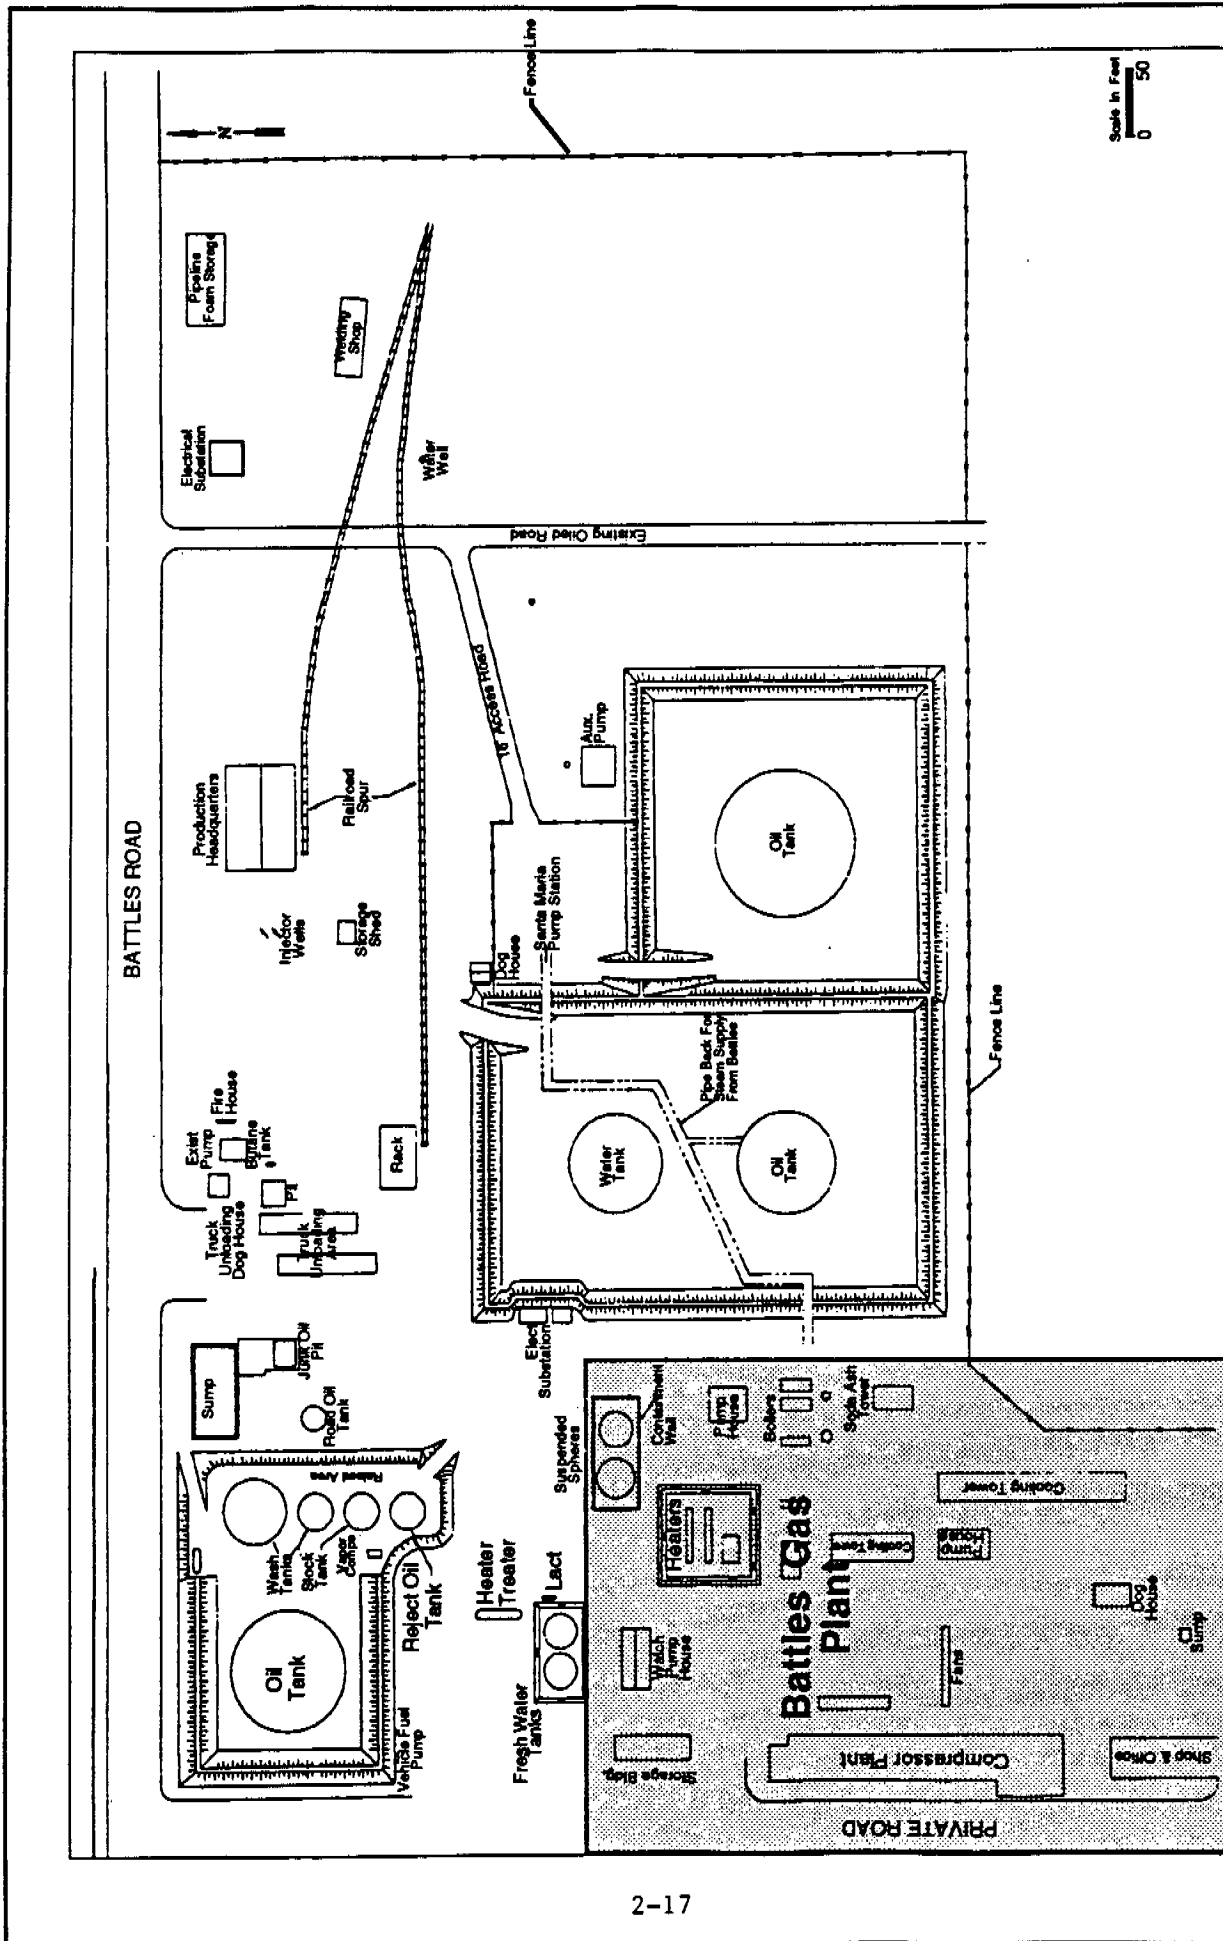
Plot Plan of Existing Facilities at the Santa Maria Pump Station
